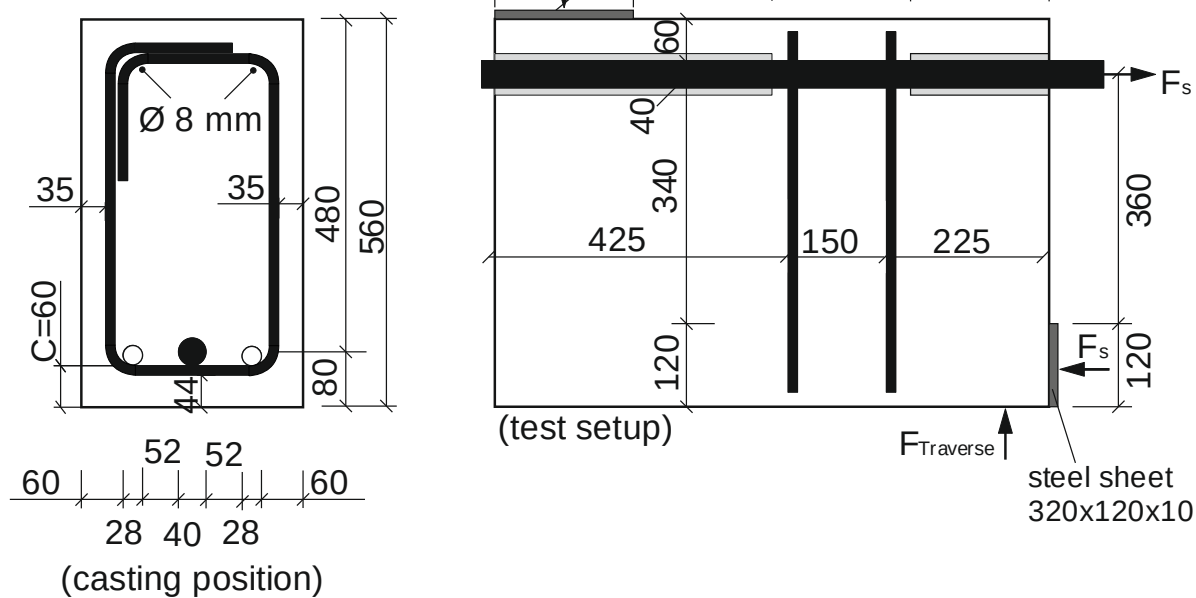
Reinforcement layout of Beam-End Tests 1, 13 and 2
